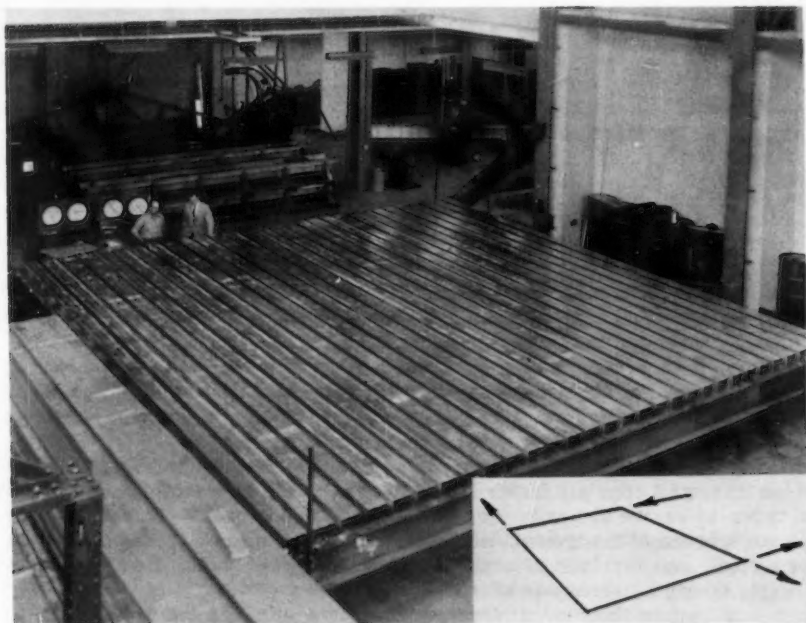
CANTILEVER TEST OF TYPE 9 PANELS
